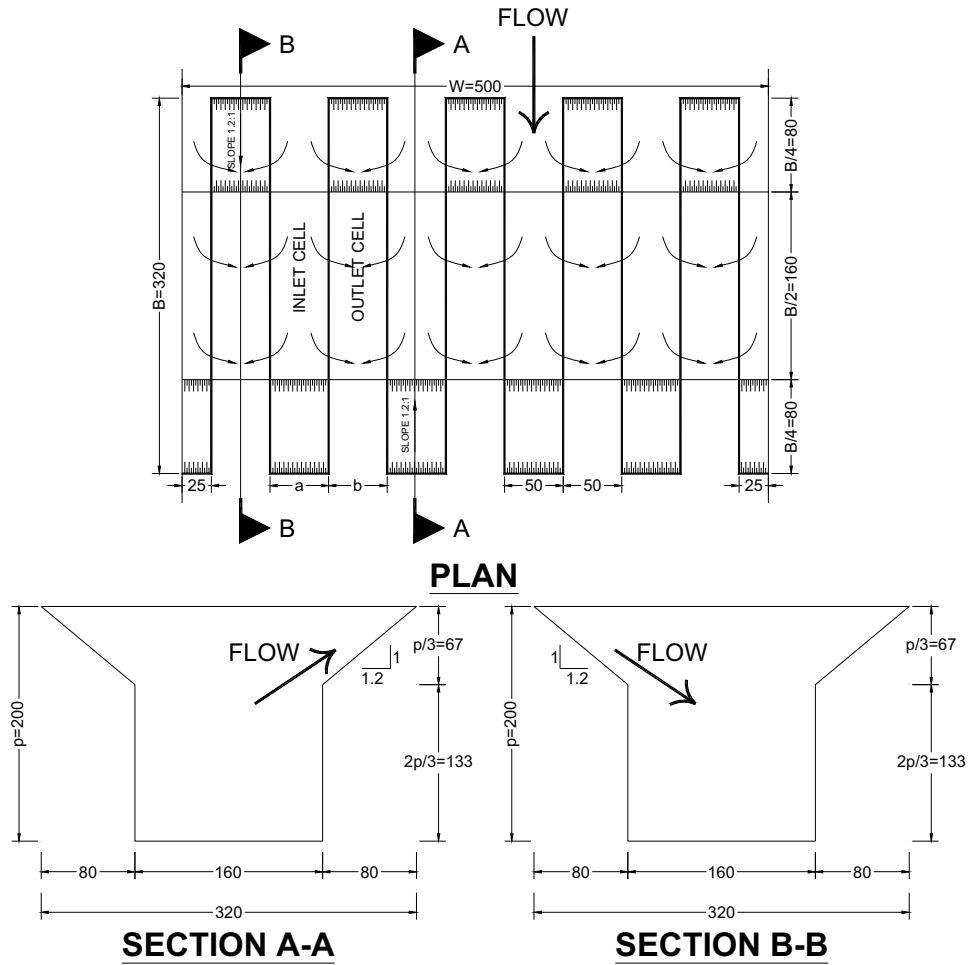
Plan and section of model P_1M_3 (dimensions in mm)
